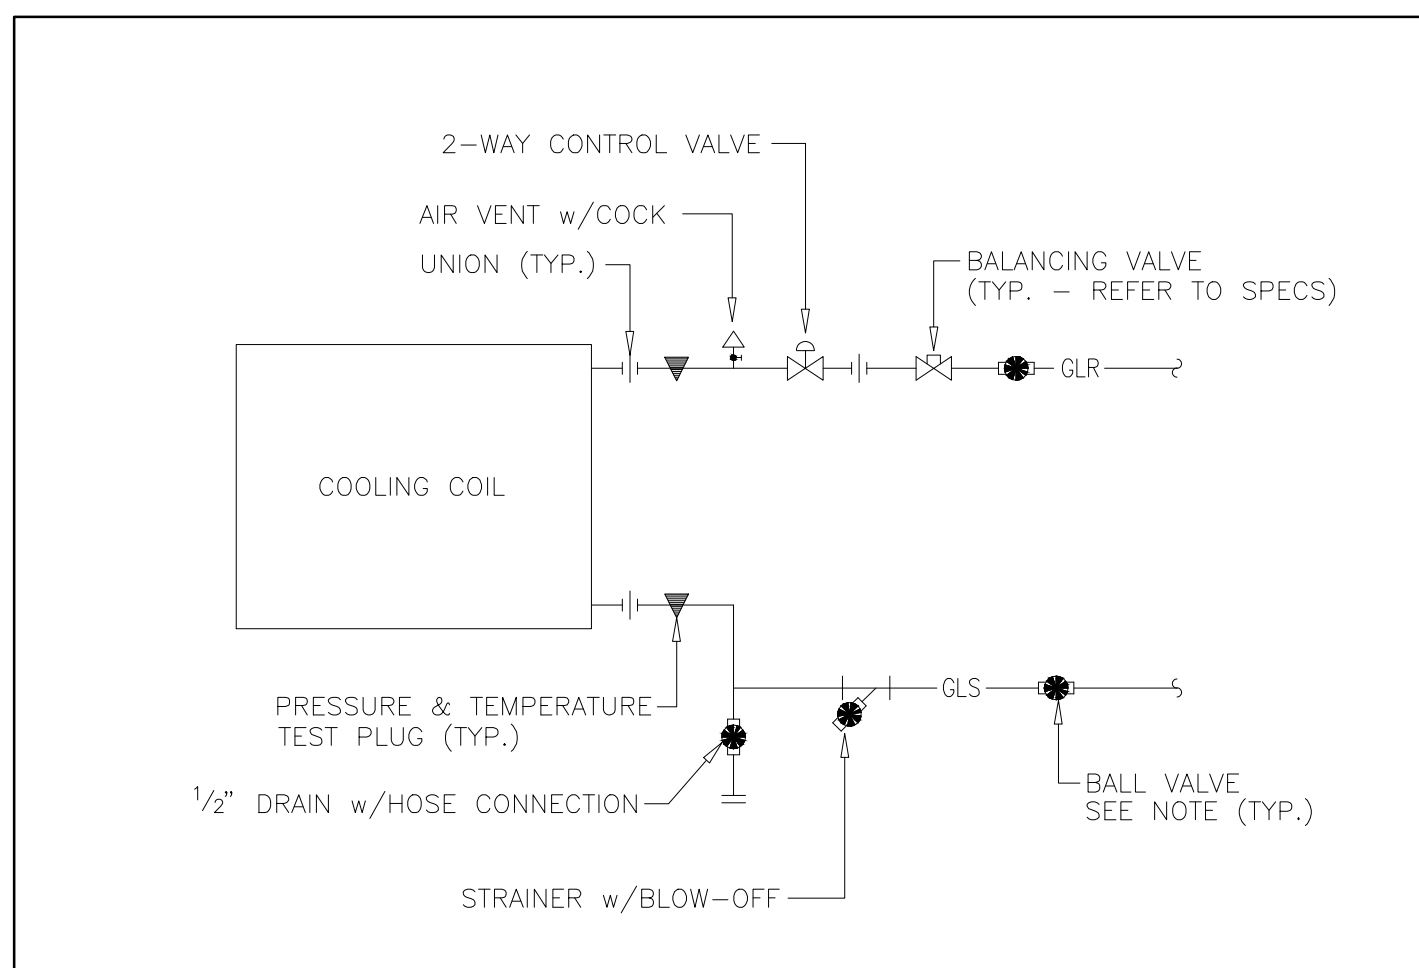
DETAIL - GEO WATER SOURCE HEAT PUMP PIPING
